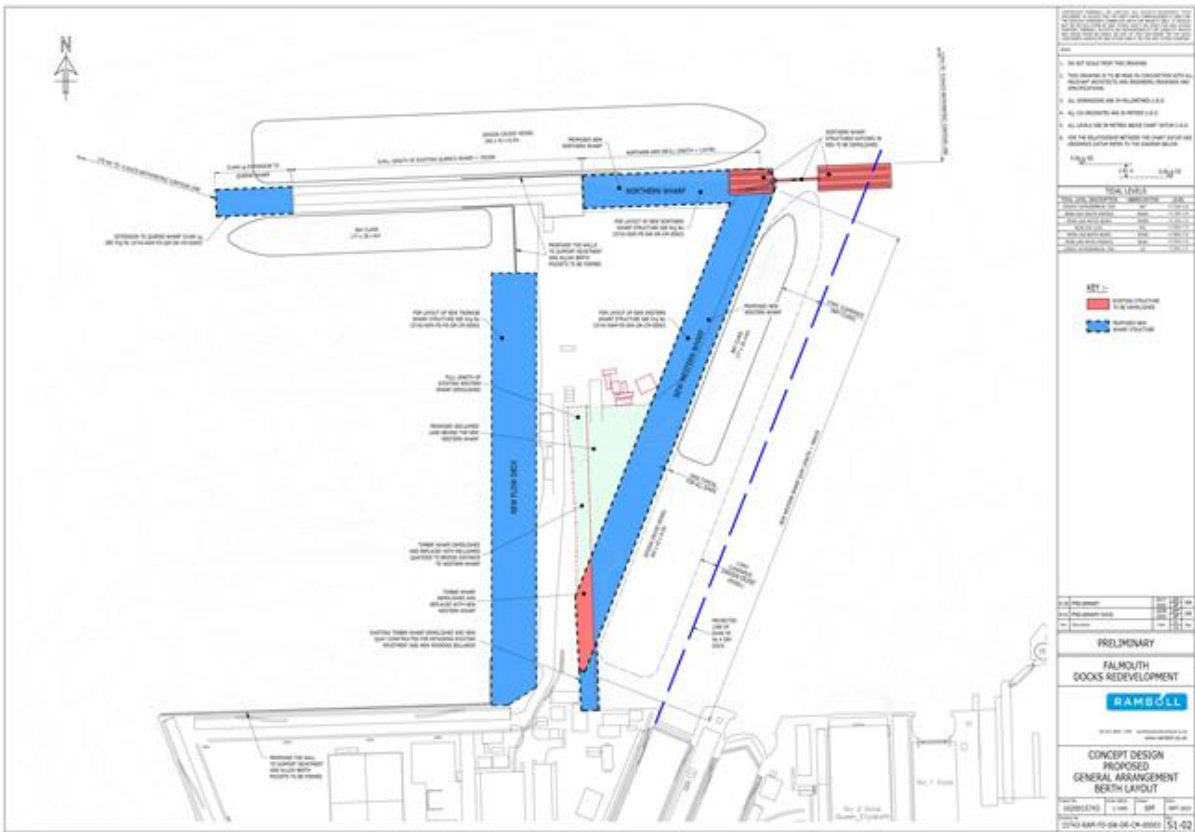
Plan Showing Proposed Marine Structures to be Demolished
